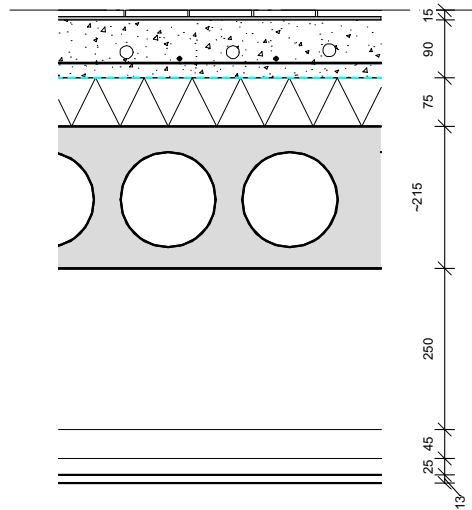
The picture shows a detail drawing of a ‘common construction,’ in this case, a floor construction between bathrooms. The construction layers in the drawing are from the top: 15 mm tiles, 90 mm of concrete with floor heating tubes, 75 mm of insulation, 215 mm of hollow core slab, 250 mm space, 45 and 25 mm for the construction that holds the ceiling, and 13 mm for plasterboard as the ceiling. Between the insulation and the concrete, the designers place a membrane to avoid that concrete goes through the gaps between insulation mats.
